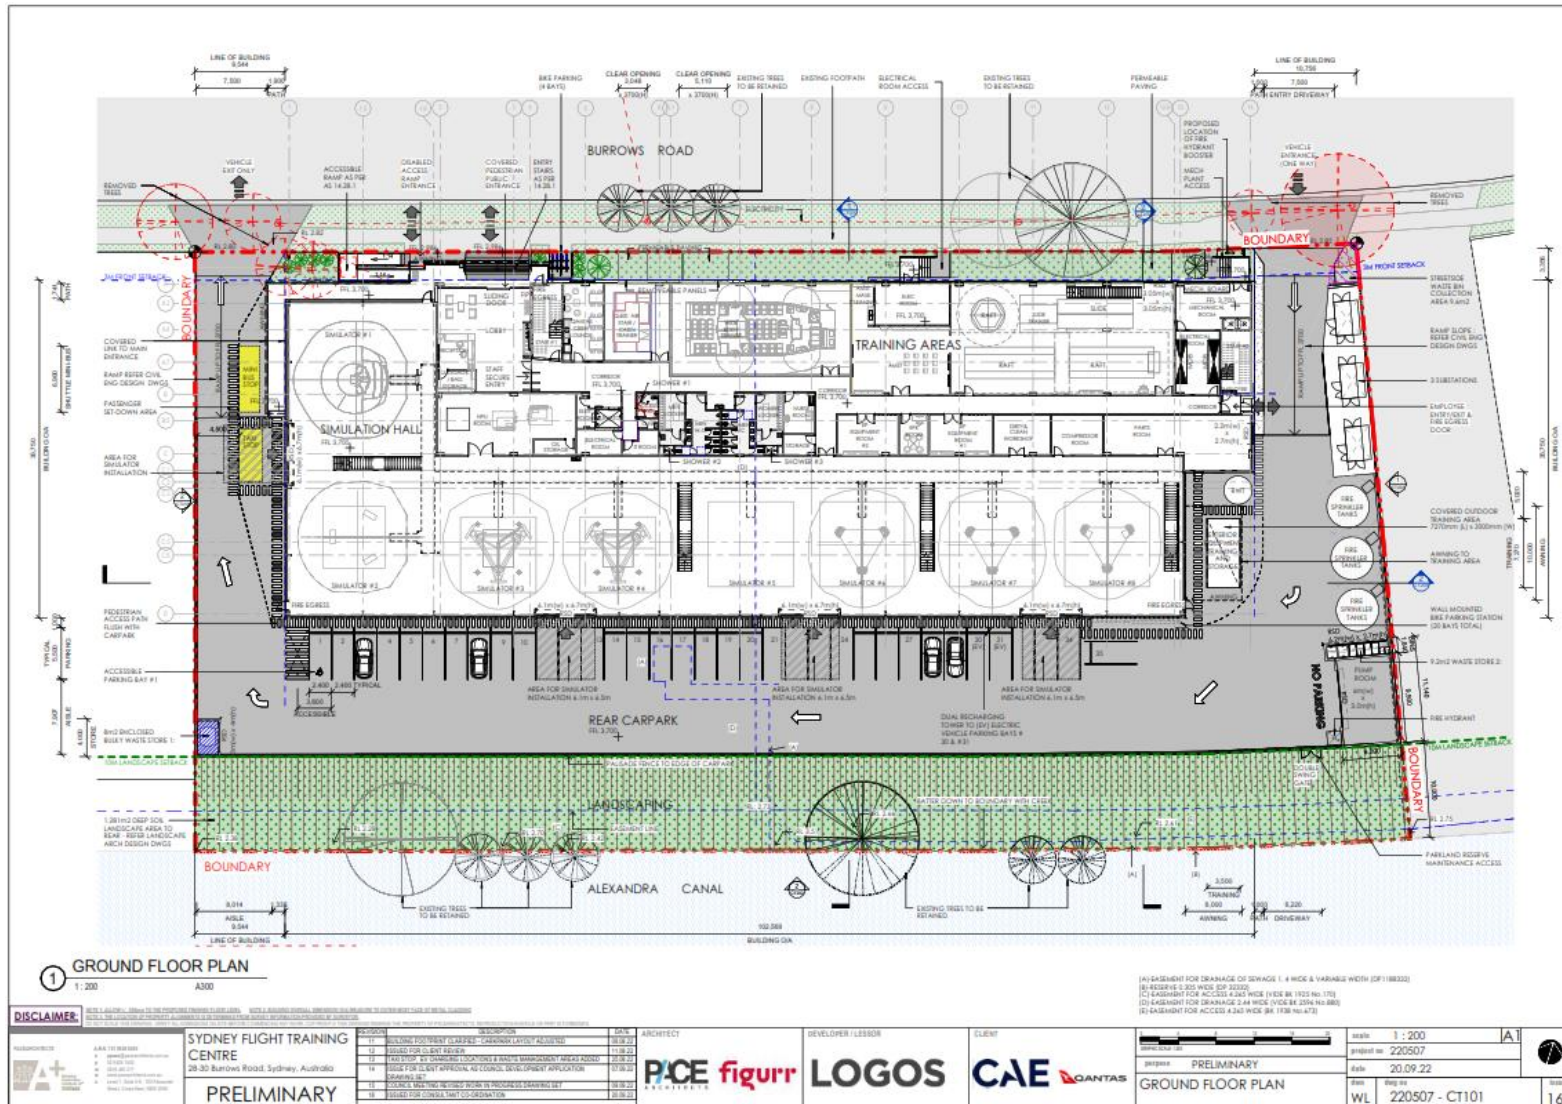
Ground Floor plan of Sydney Flight Training Facility 28-30 Burrows Road. (Source: CAE and LOGOS, 2022)
